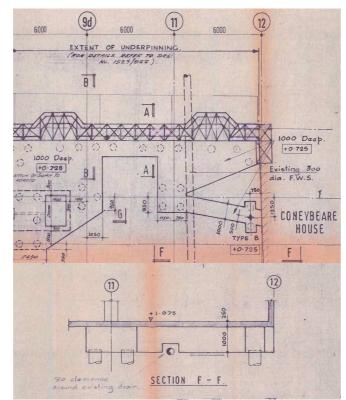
Sewer location below Keats House as shown on Engineer's plan section F-F
